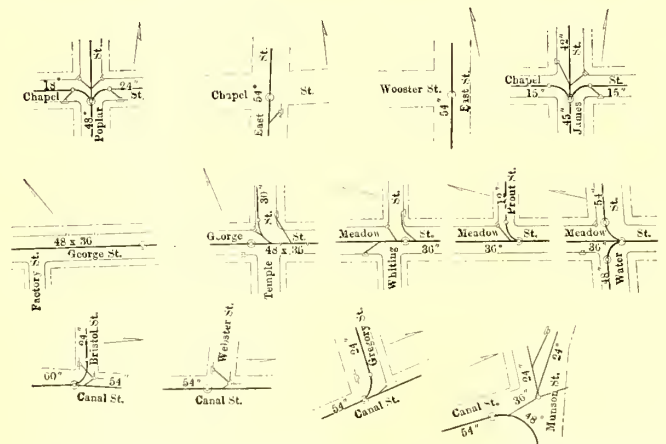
SECTION OF CHART SHOWING SEWER MANHOLES
